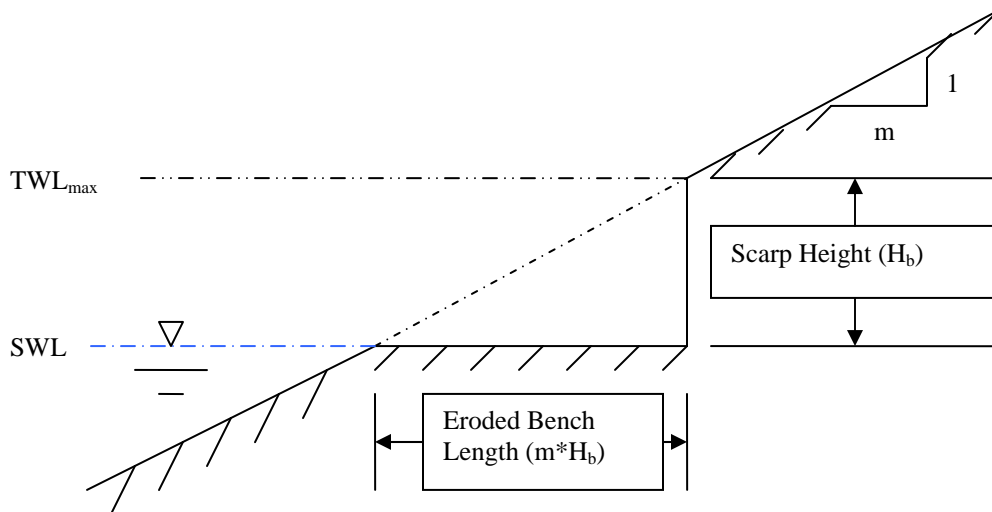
Basic Layout of Wave Cut Bench on Levee Slope
